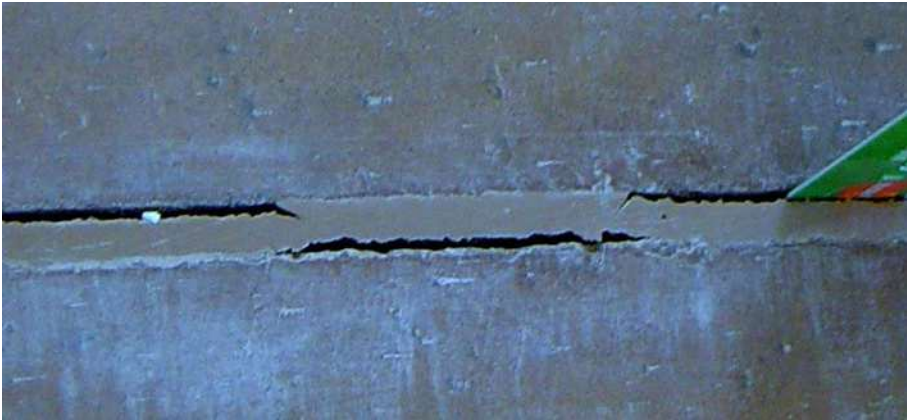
Adhesive (filler-to-sidewall) joint filler separation
